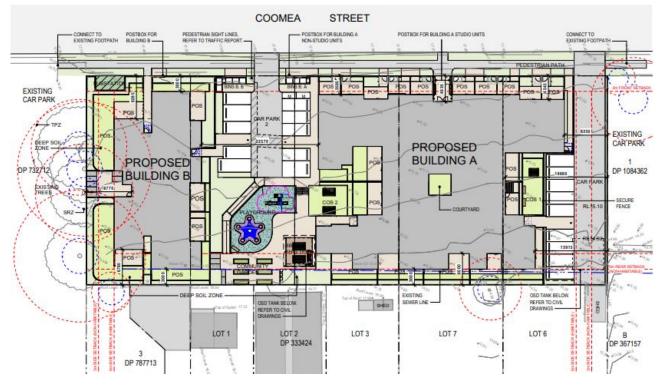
Site Plan of proposed development (Dwg No. DA01)
